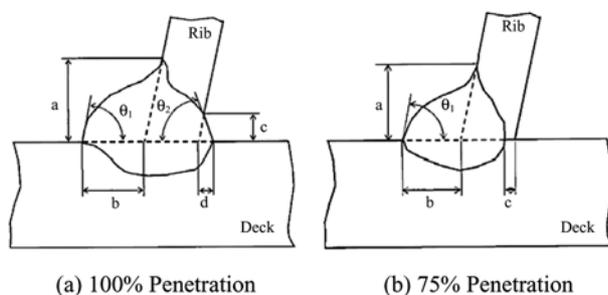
Rib-to-deck welded joints fabricated with 75% and 100% penetration.
